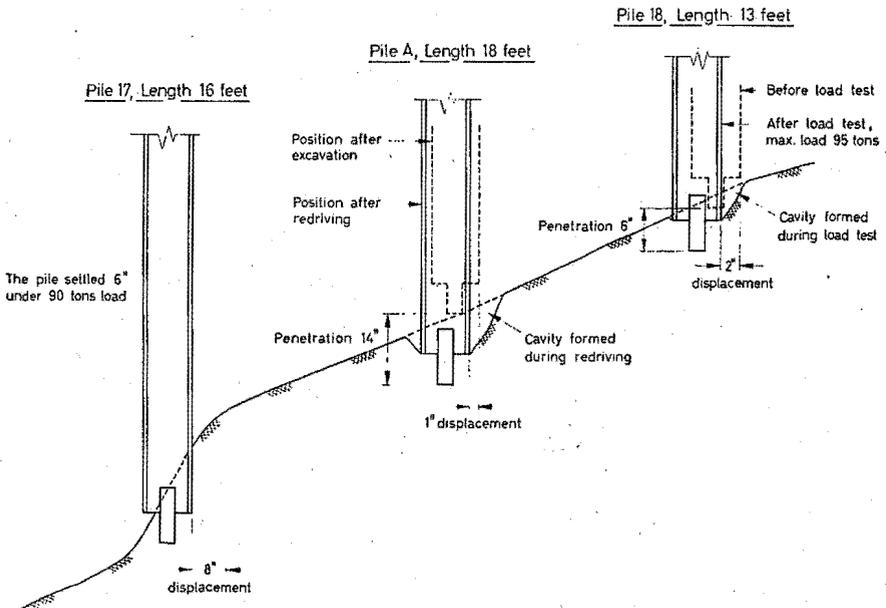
STEEL PILES IN SLEMMESTAD EXCAVATED AFTER THE DRIVING (BERNTSEN 1955).
